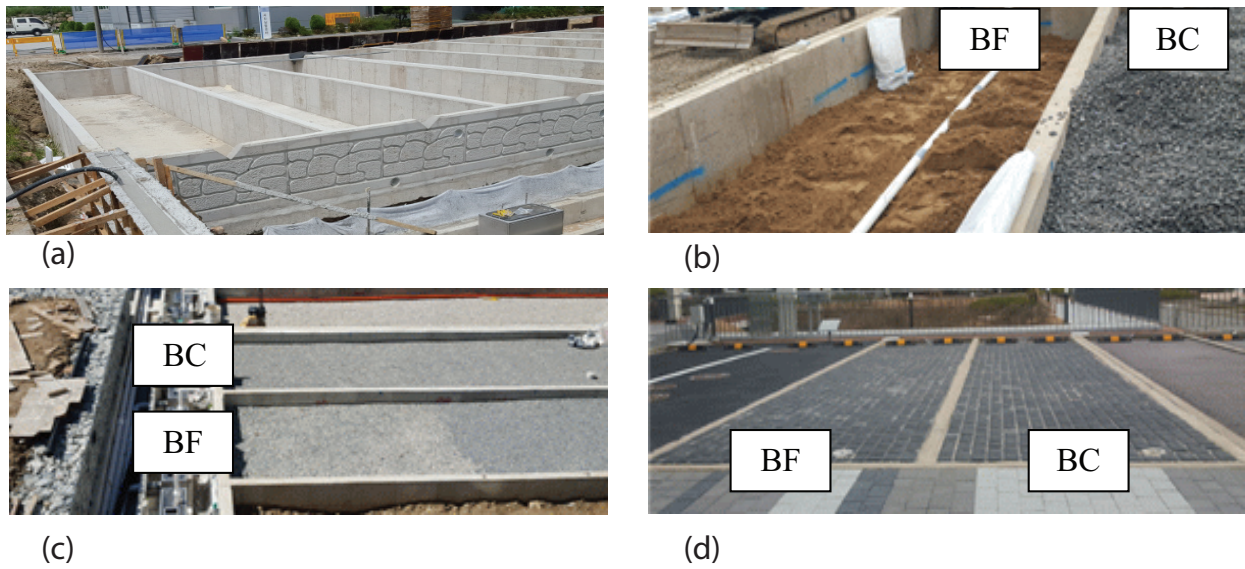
Permeable block pavement testbed at Korea GI-LID Center: (a) concrete cells at the parking lot testbed, (b) base layer under construction, (c) constructed bedding layer, and (d) permeable block pavements after construction.
